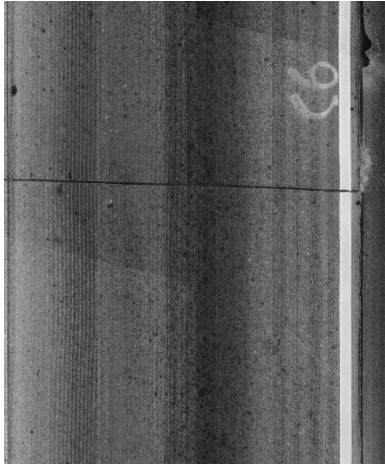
Selected I-16 test site on concrete shoulder joint distress detection
